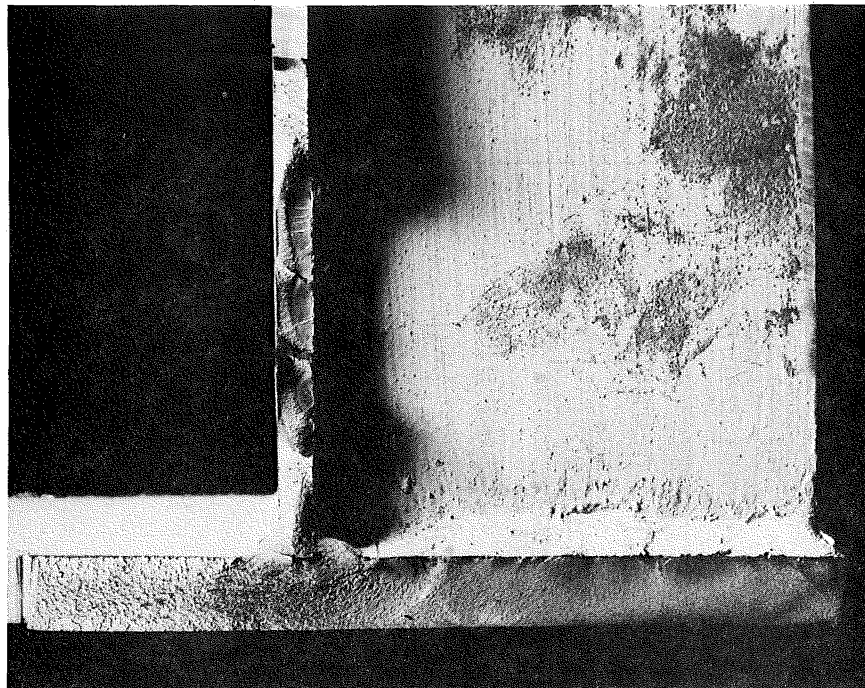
Typical Fatigue Crack Surface at Type 3 Stiffener at Failure
